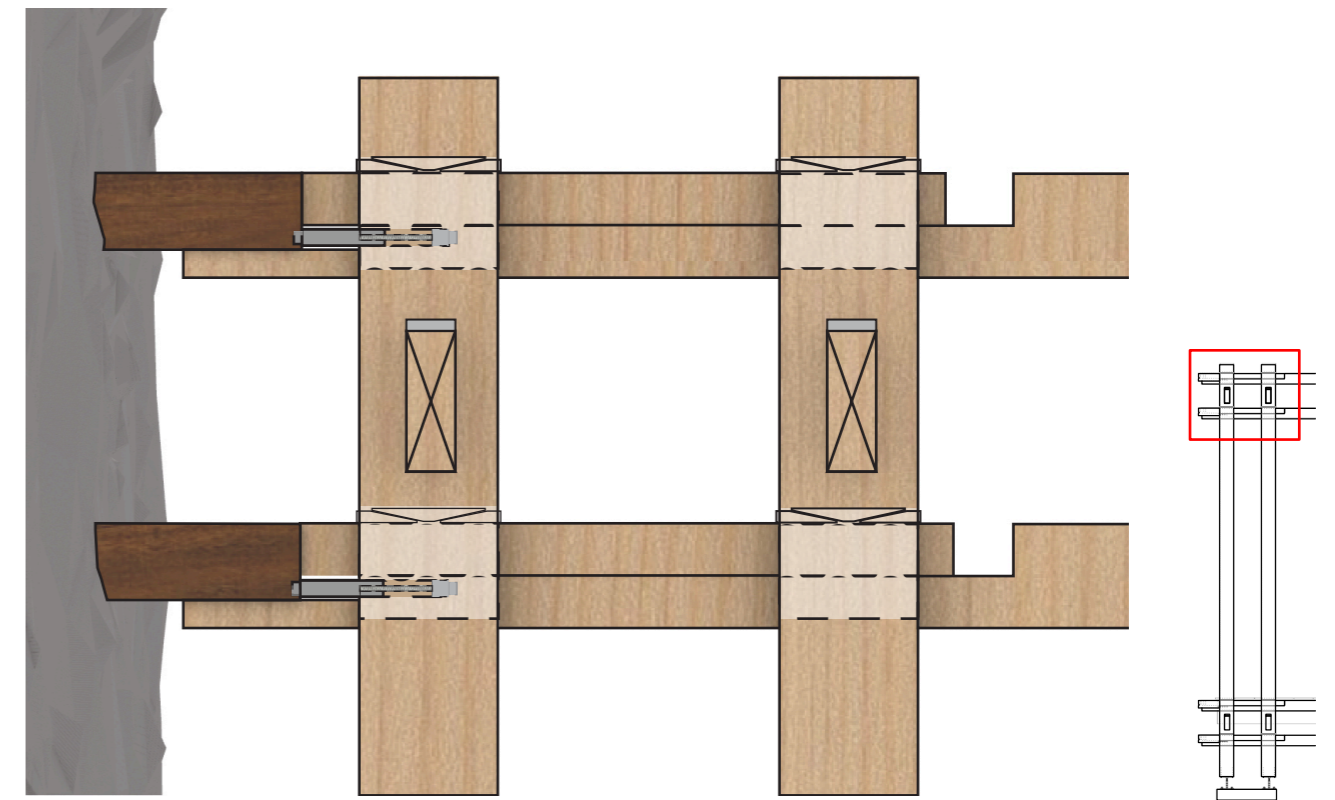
1:1 detail drawing of the adjustable Nuki joint system.
